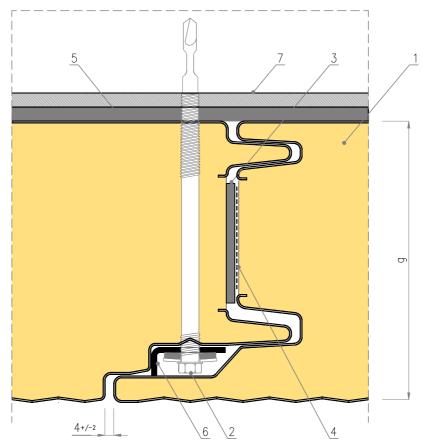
IzoGold PIR/PIR+ - vertical layout, fastening to the structure
